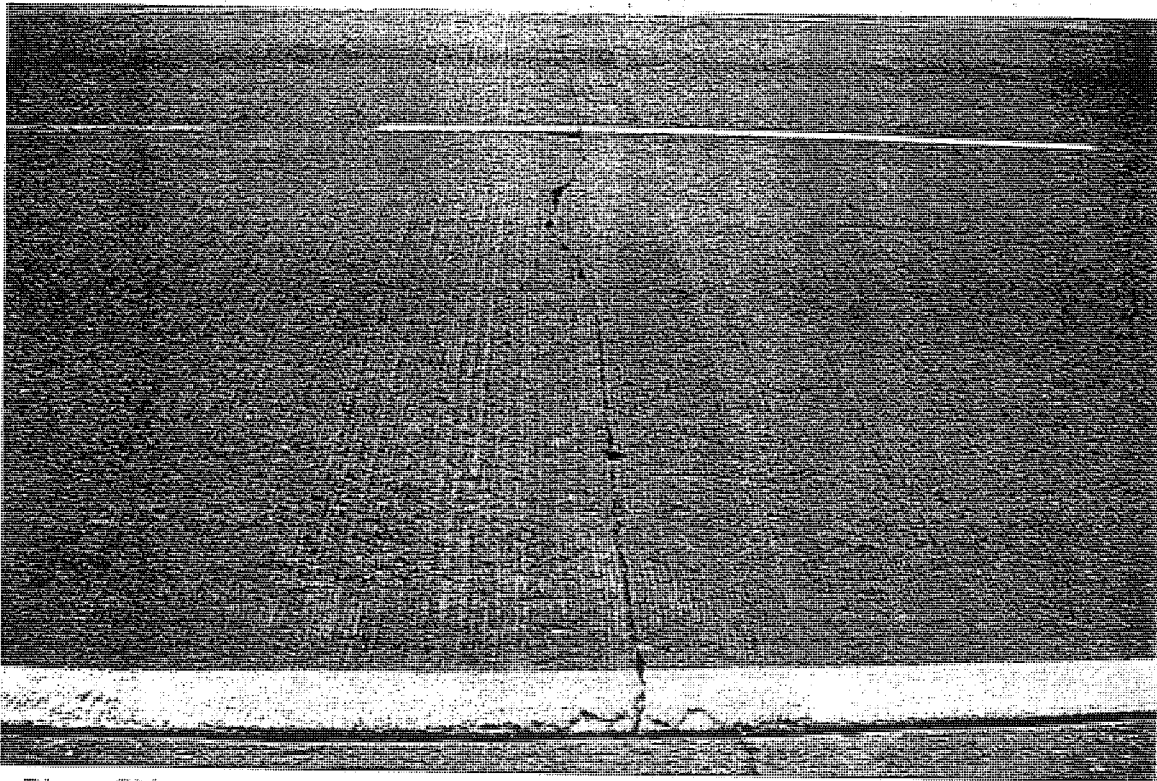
A typical third point full width crack showing the beginnings of spalling on CSN# 25132-06582A SB.
